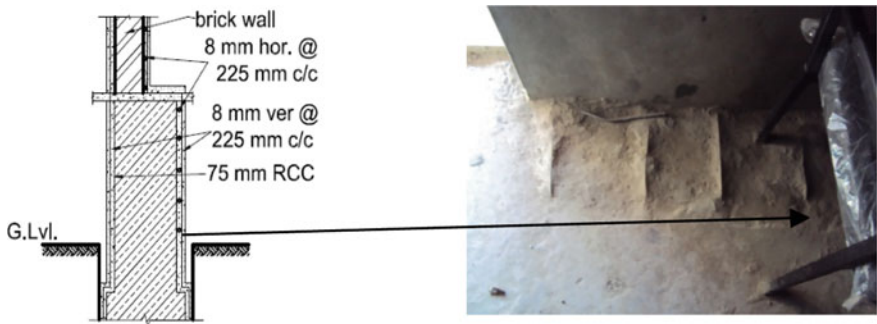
Detail and GF wall jacketing reinforcement bent at floor level
